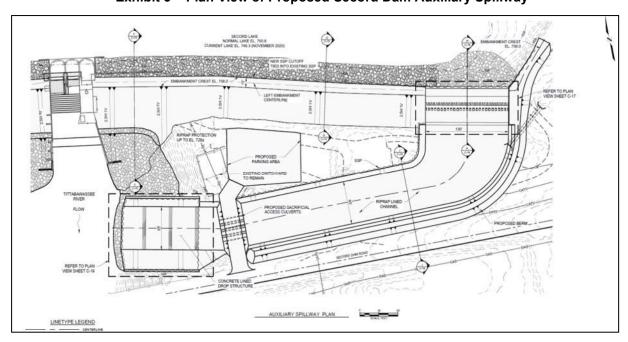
Plan View of Proposed Secord Dam Auxiliary Spillway
